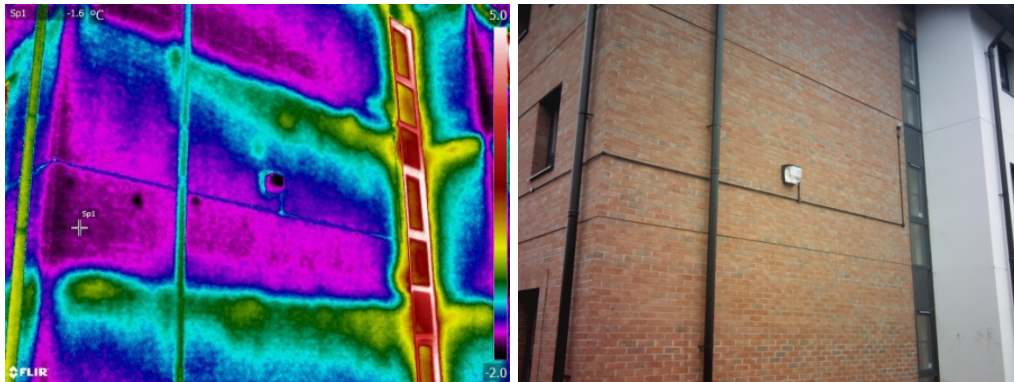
(left): IR thermal image shows curtain walling at elevated apparent temperatures
